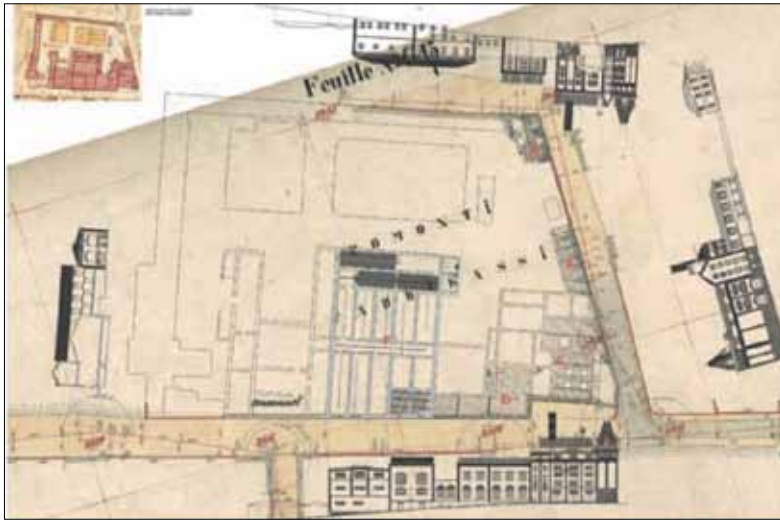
Plan and Facades of Bomonti Beer Factory (Tanyeli & İkiz, 2009).
